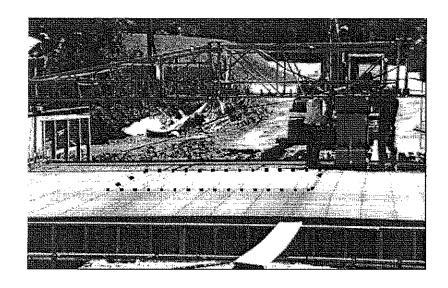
Photograph of Bridge Deck Prior to Concrete Placement. Dots were sketched to identify the location of GFRP Reinforcement
